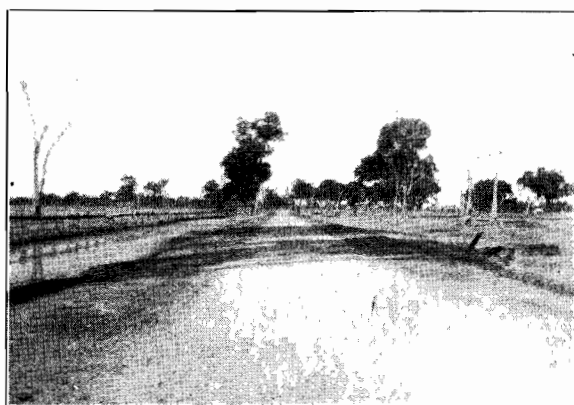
Murray Valley Highway.—Showing shoulders placed on narrow road-way.
